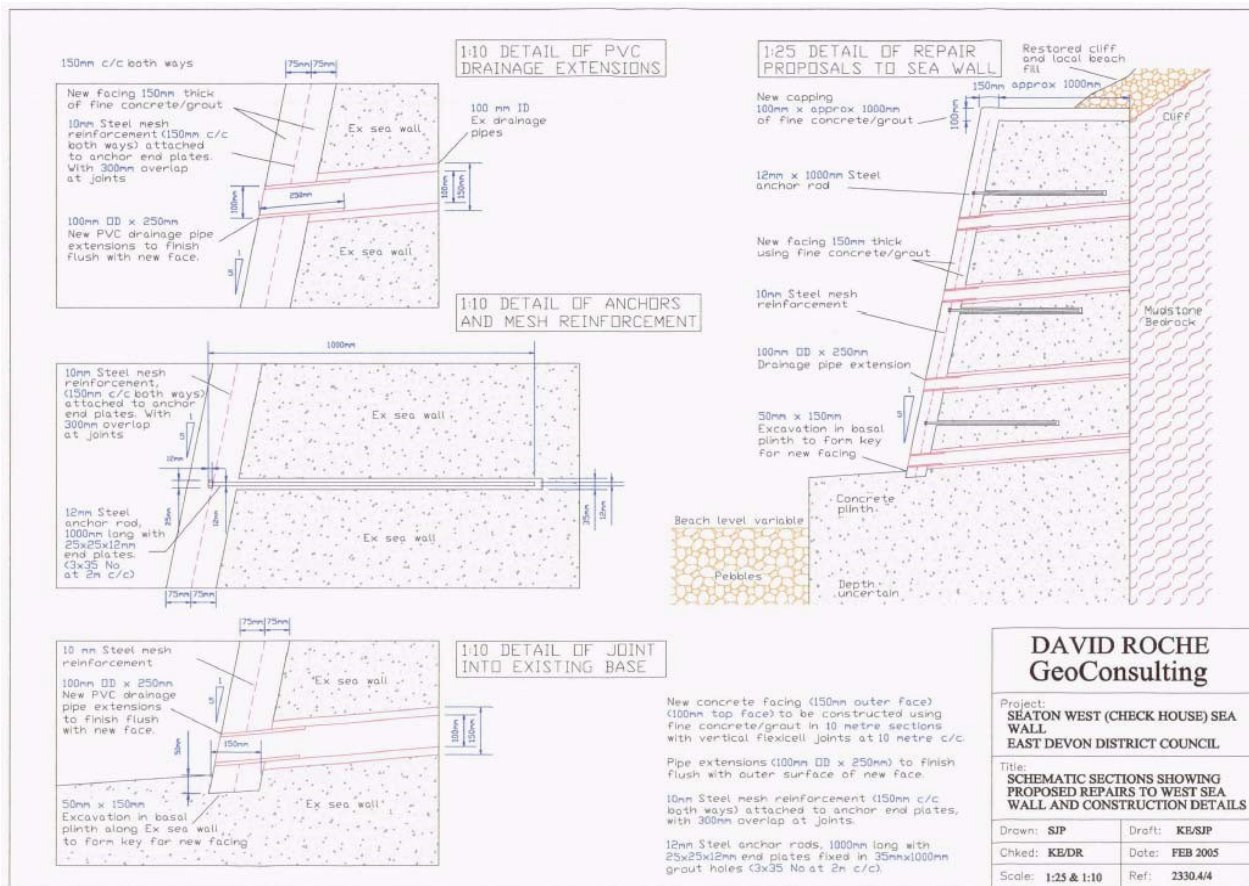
Schematic section showing proposed repairs to the west sea wall and construction details
